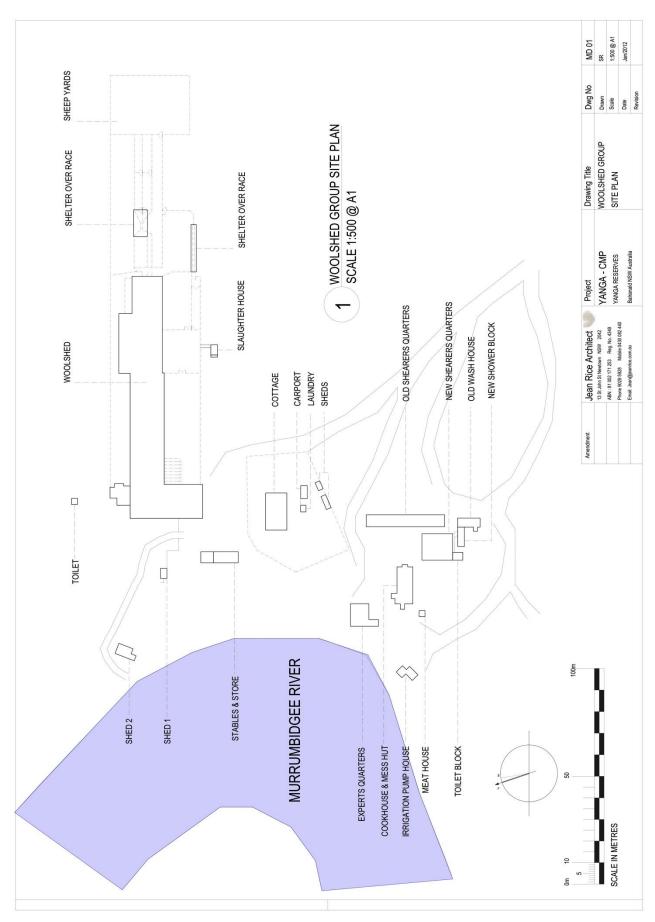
Woolshed Group site plan. Jean Rice Architect, site assessment 2009.
